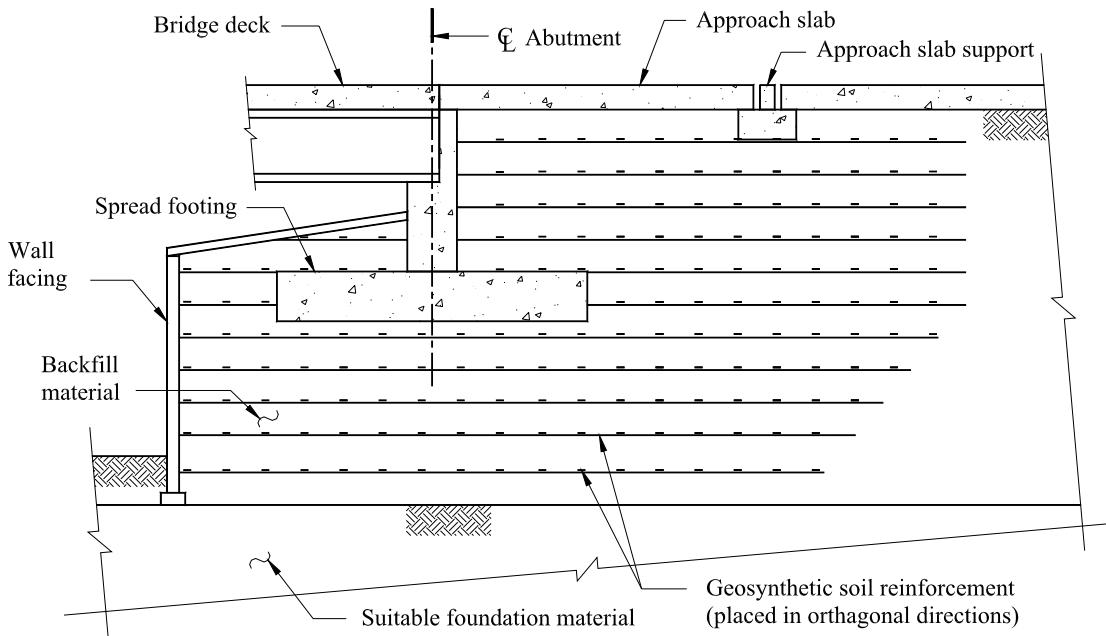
Cross-section of a GRS bridge abutment [adapted from Abu-Hejleh et al., 2000].
